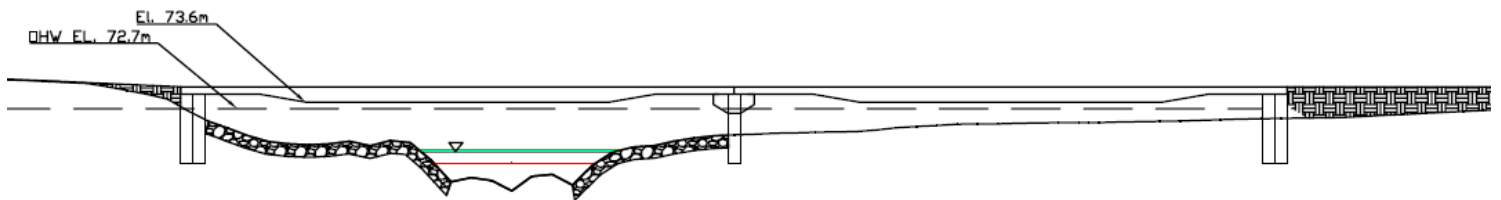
Proposed bridge design section view at Calapooia River crossing
